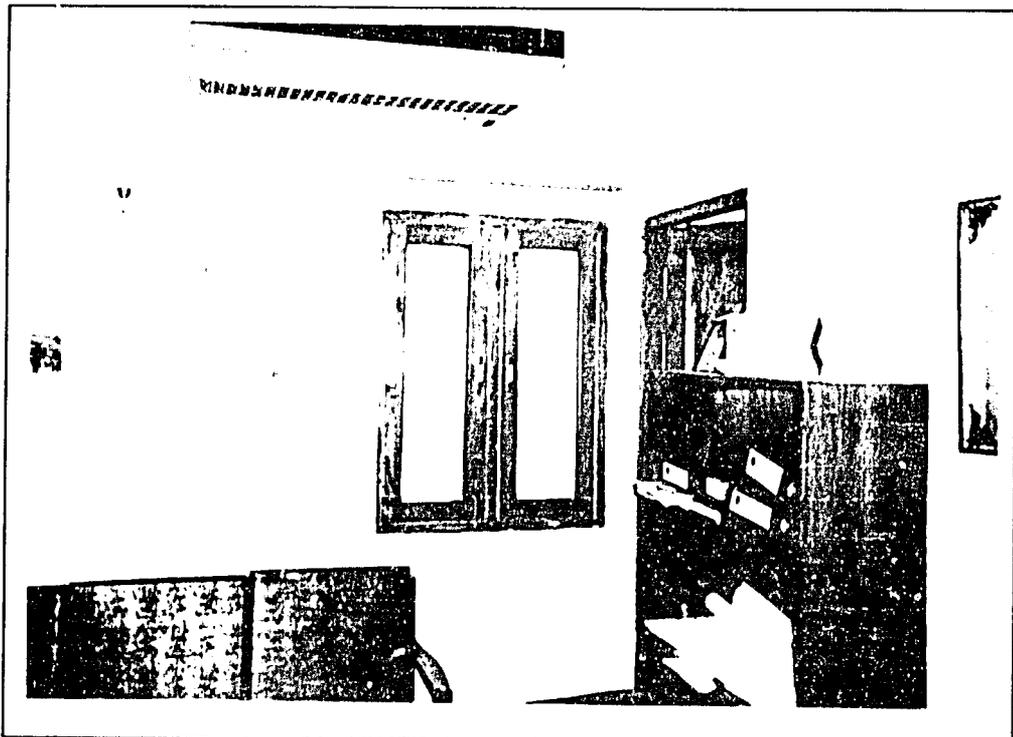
Peshawar CCSC Headquarters Building. Inside view of Director's Office. Cable to enter through window frame, over door, to floor level, along floor to desk location.
